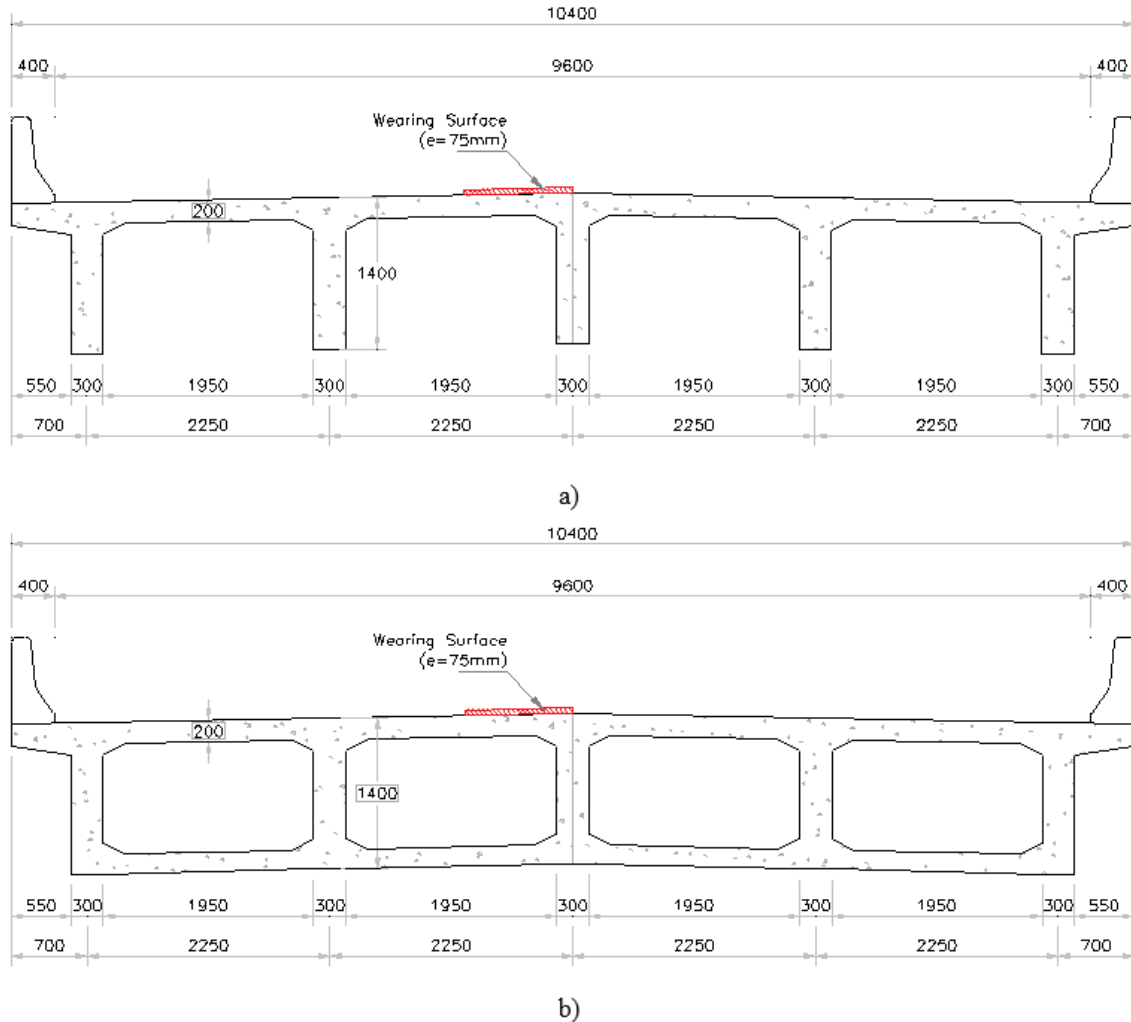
Typical section of the superstructure. a) Positive moment section b) Negative moment section
